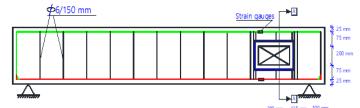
Detailing of reinforcement steel for strengthened beams (B5, B6 and B7).
